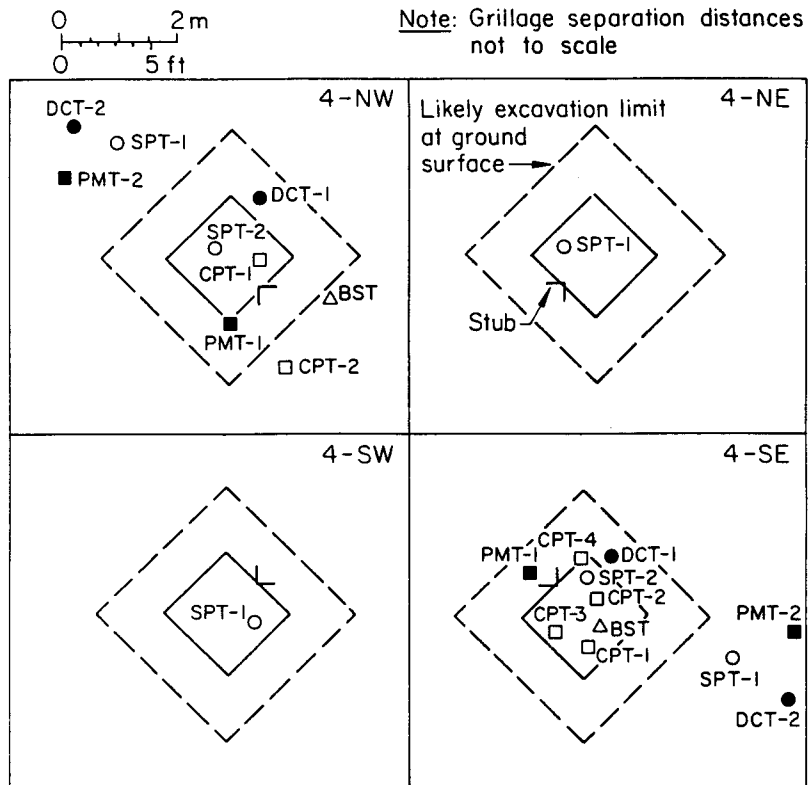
In-Situ Test Locations for Hickling Station Grillage Set No. 4
